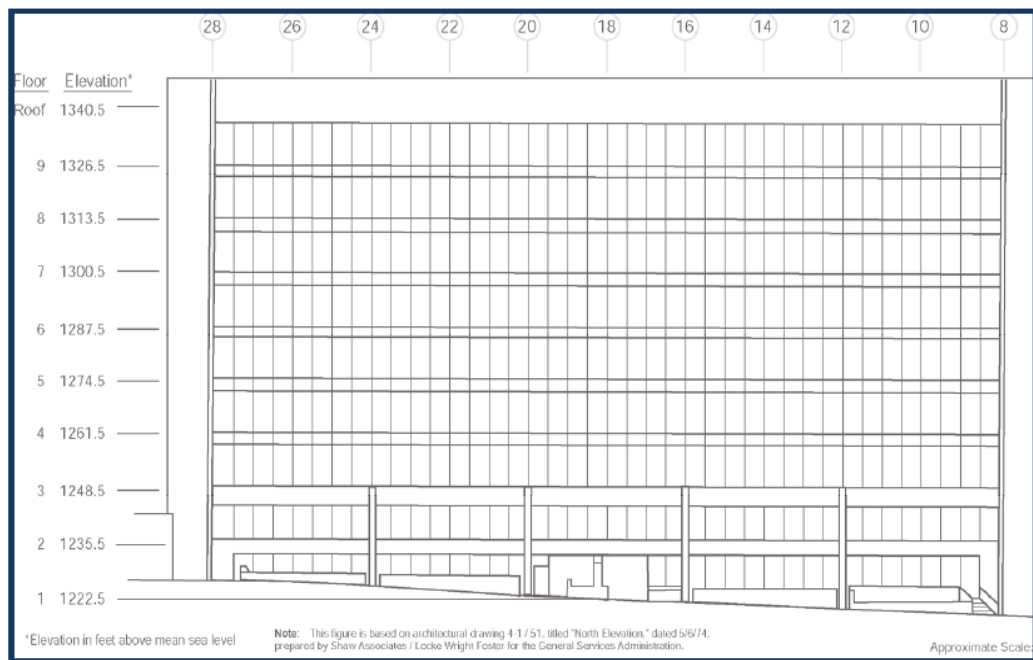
North Face Elevation (FEMA 277, 1996)
